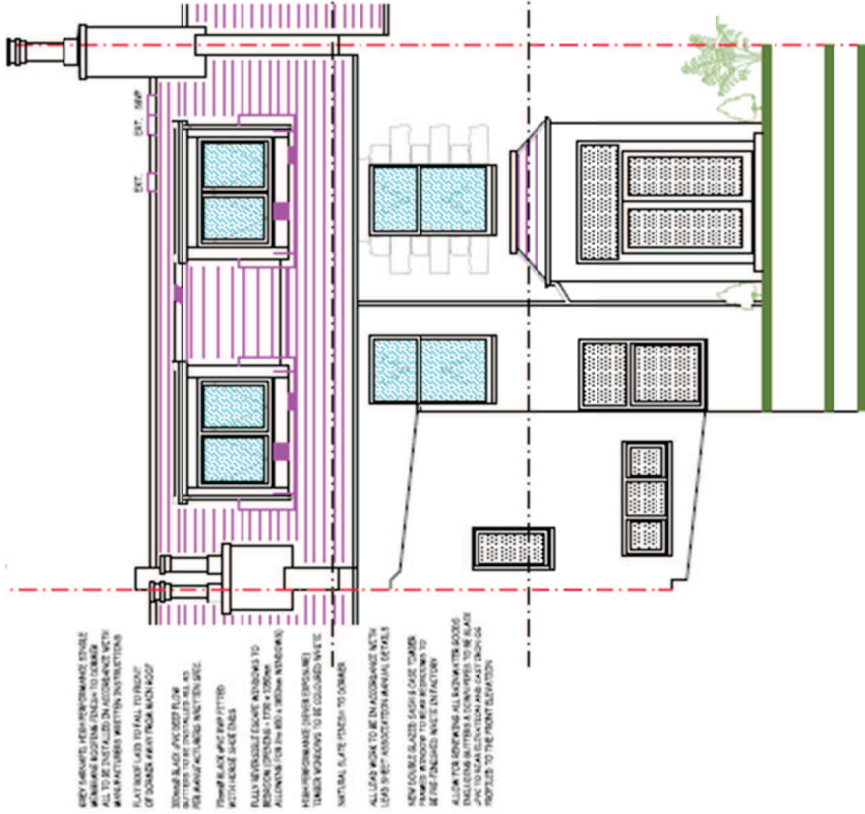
Approved Dormer at 57 St Swithen Street - Ref: 130781 (nts) Proposed Dormer to 37 Carlton Place (nts)
